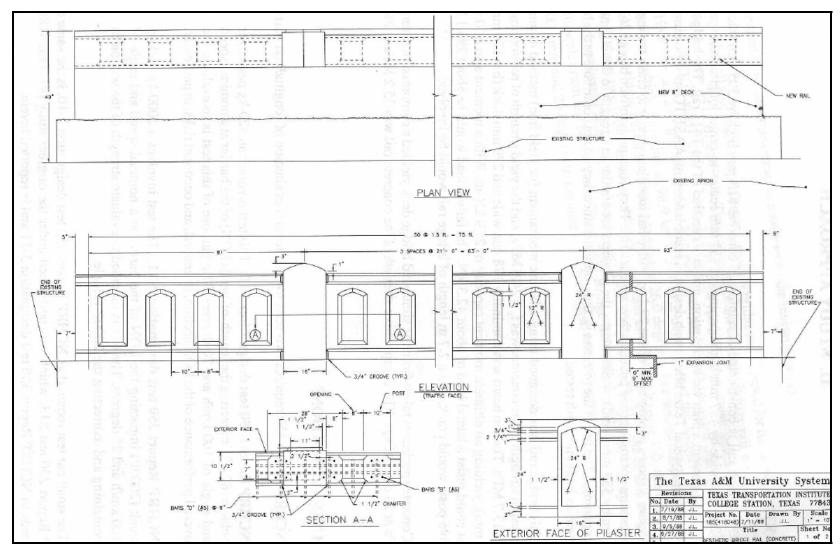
Layout and Cross Section of TxDOT T411 Bridge Rail
